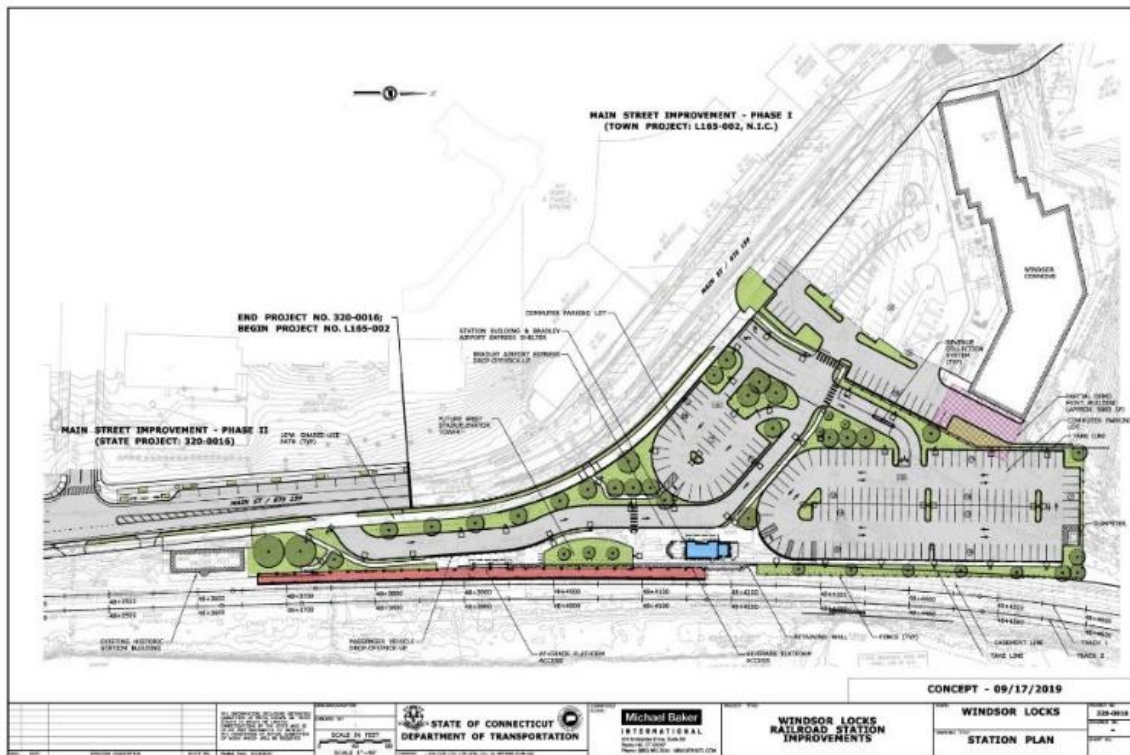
Windsor Locks Railroad Station Improvements Plan, 2019
